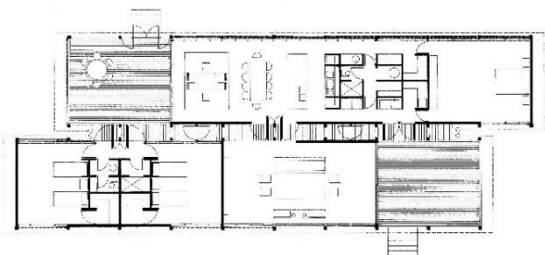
Glenn Murcutt, *Marie Short House Floor Plan*. 1974, Kempsey, New South Wales.
